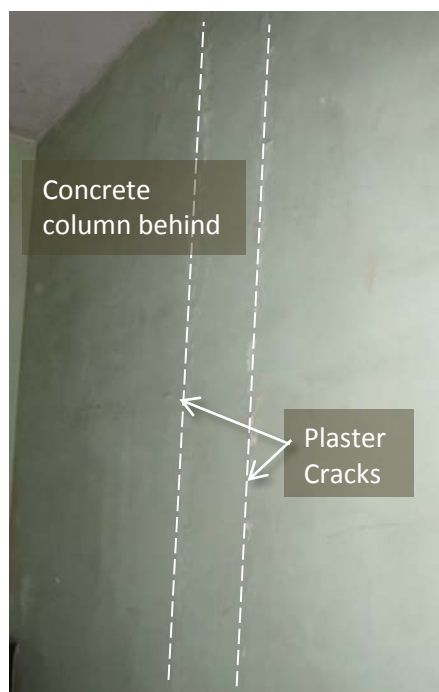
Typical non-structural cracks in the plaster at the edge of interior columns in the corridor walls (highlighted in white).
